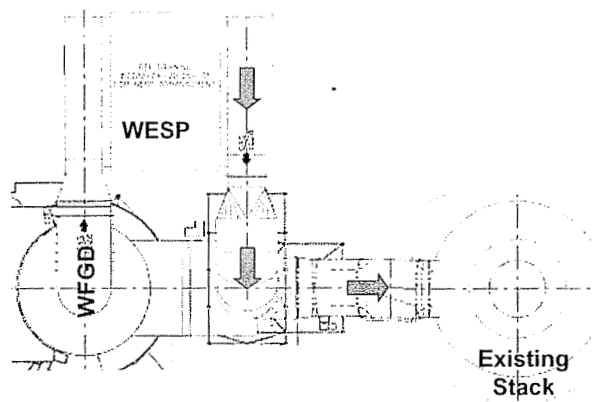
Proposed Absorber-WESP Arrangement: Plan View
